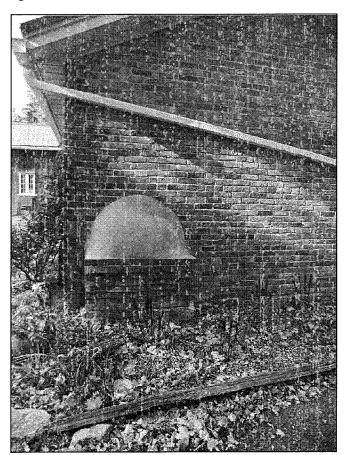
East Elevation of Bakehouse showing rear of bake oven
